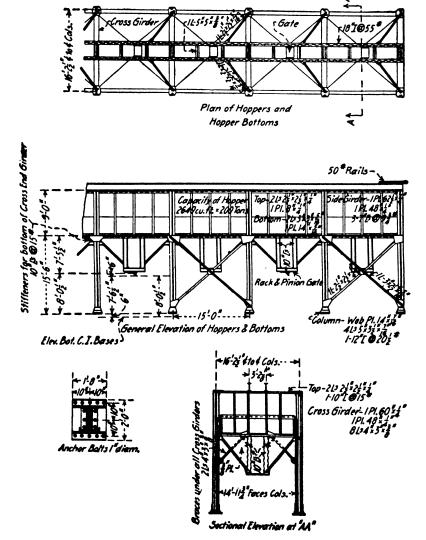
HOPPER BIN CANANEA CONSOLIDATED COPPER CO., CANANEA, MEXICO.
